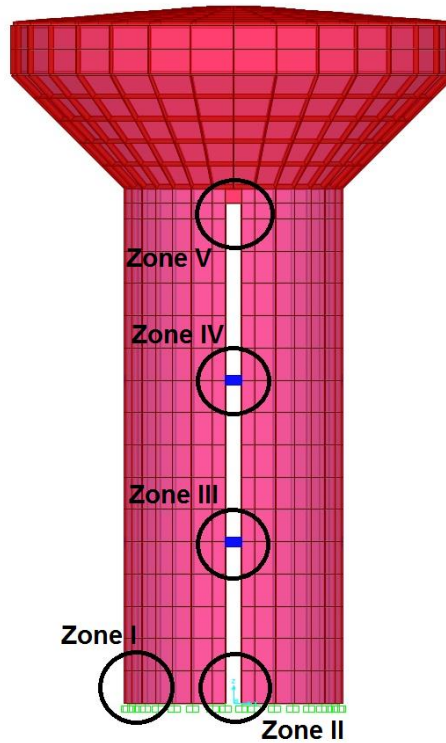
Vulnerable concrete crash zones in RC elevated water tanks
